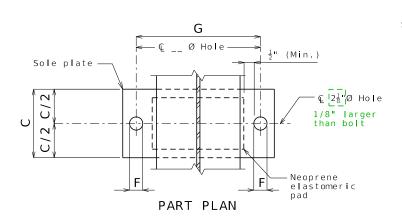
/4"Ø THRU 2 1/2"Ø ANCHOR BOLTS
